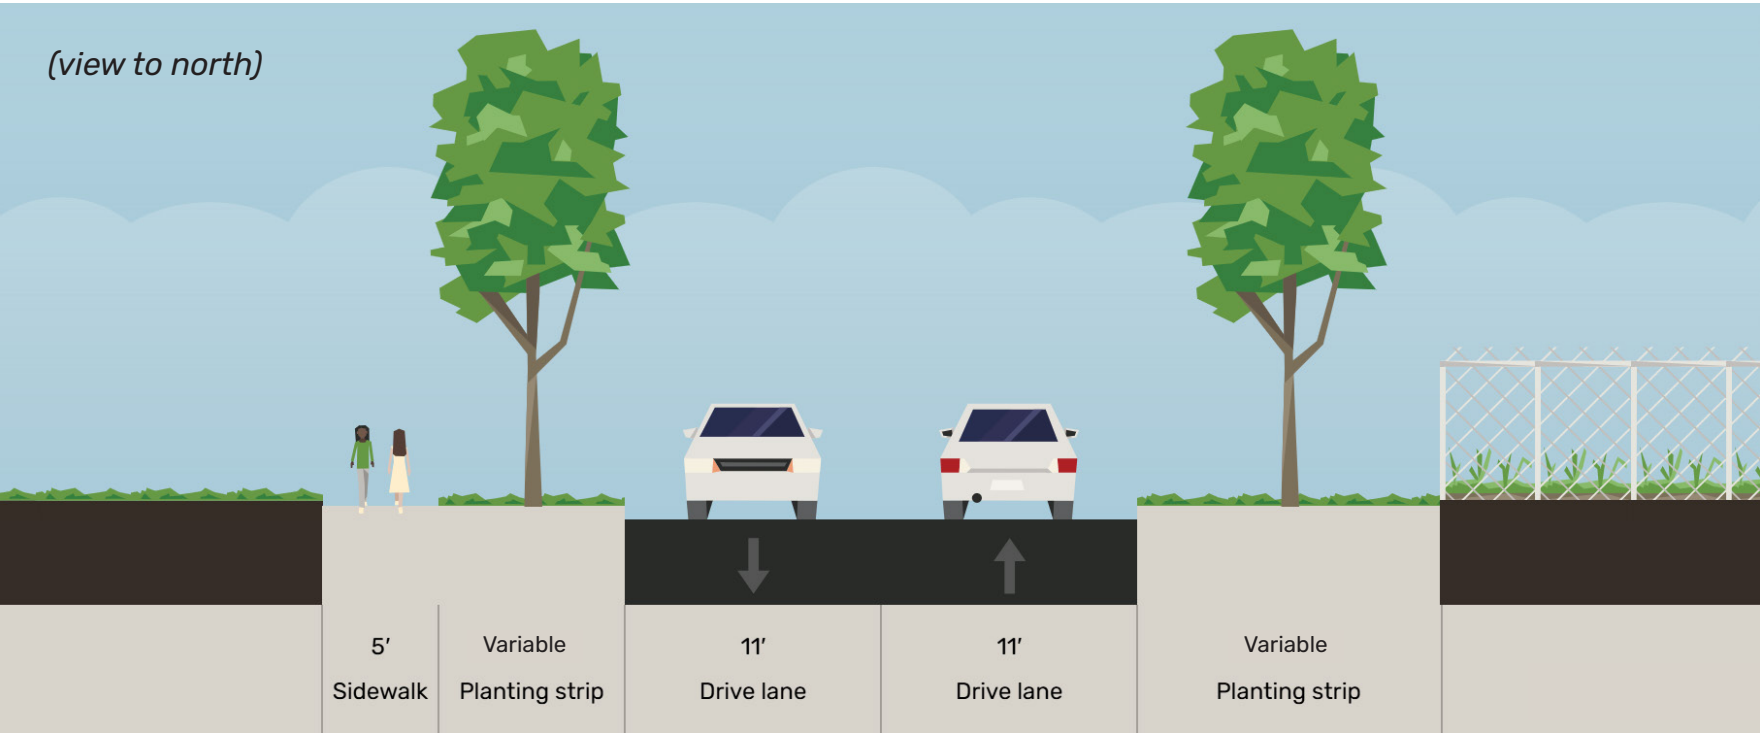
Proposed Typical Cross-Section on Garrison Road (North of Cliff Oaks Drive) (60' ROW min)
